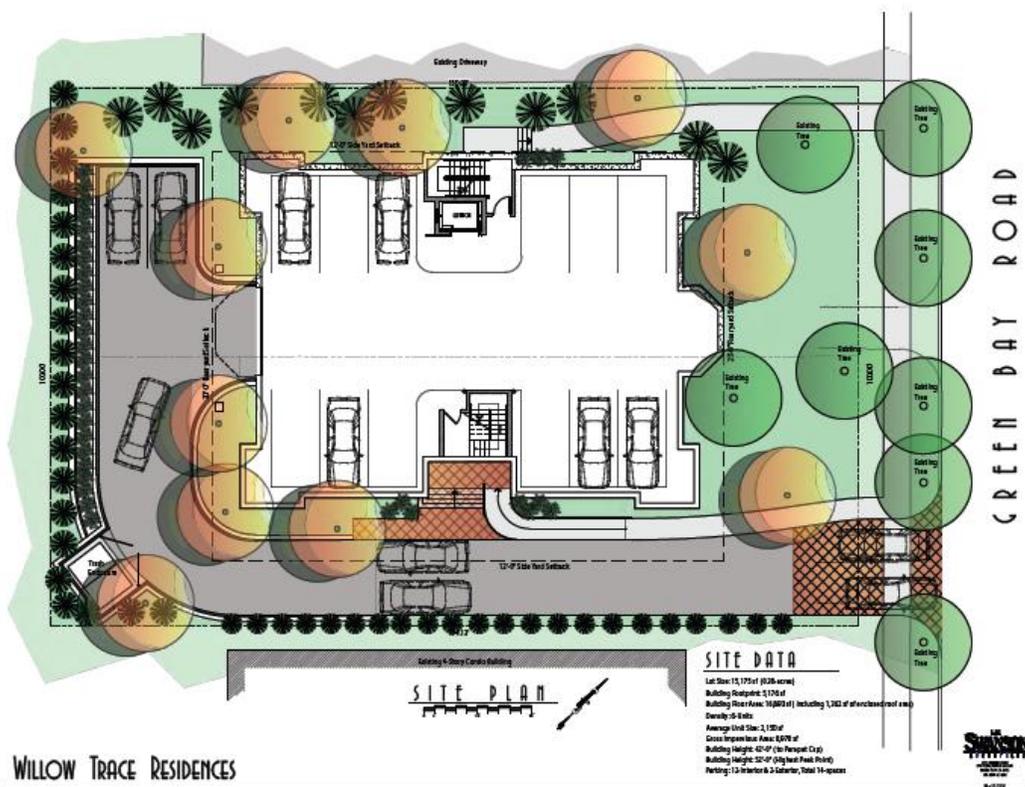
Concept Plan - Site Plan Presented to Council on July 16, 2019
